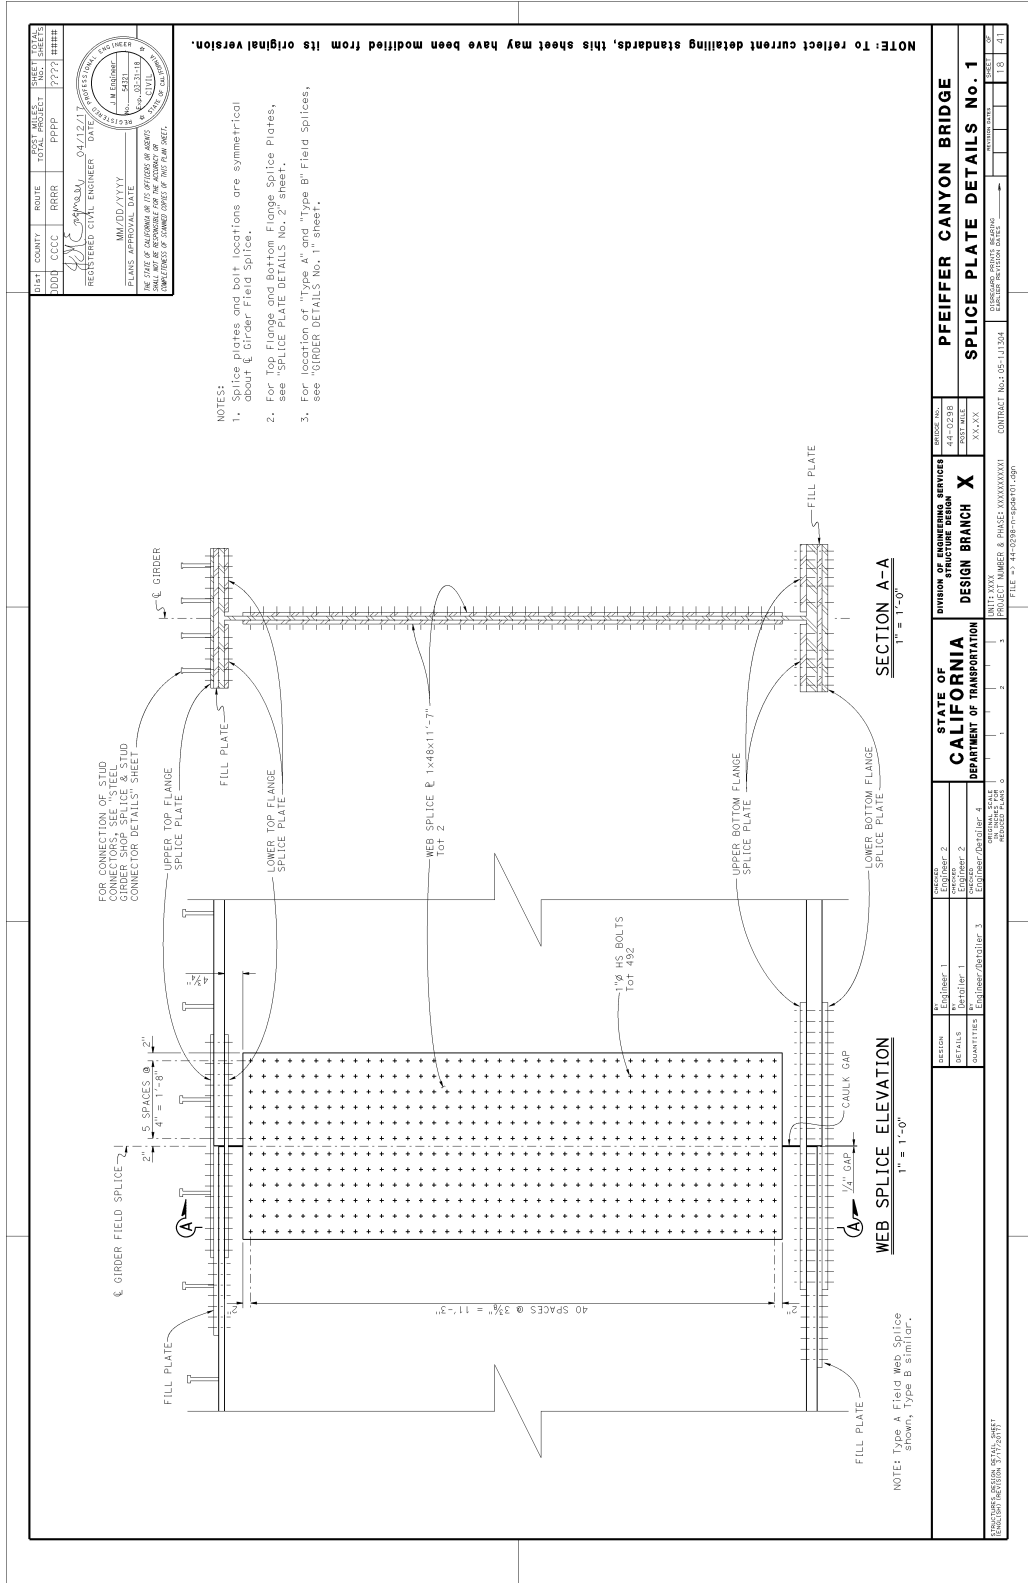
A.A.3 Steel Girder Bridge Detailing Example 3
